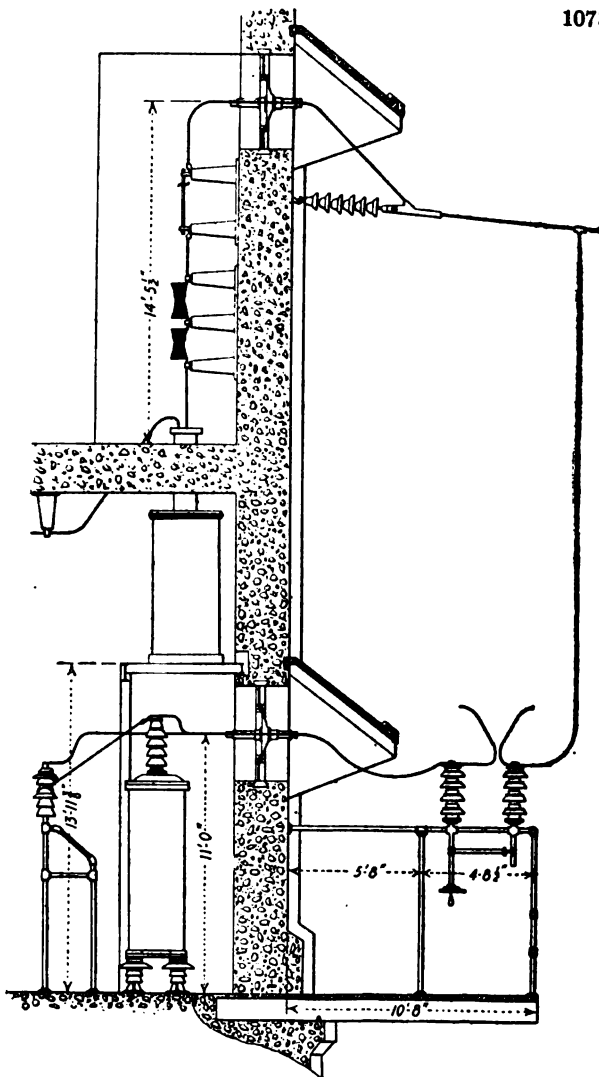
PENNSYLVANIA WATER AND POWER CO. CROSS-SECTION THROUGH TRANSFORMER HOUSE, SHOWING OUTGOING LINE
